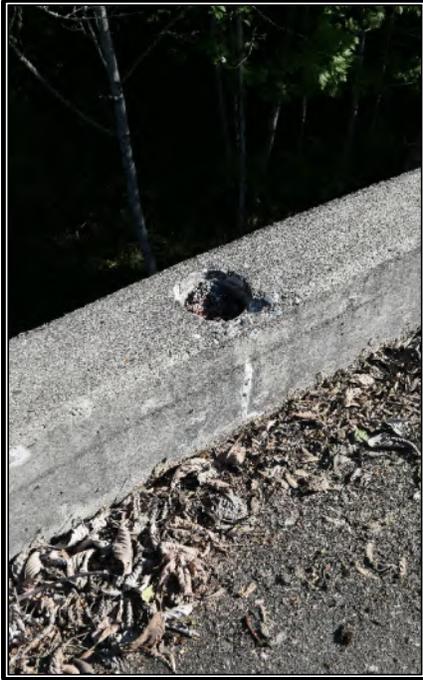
Dakin 2 - Failed Concrete Threadbar Cap, Threadbar can be seen in hole
